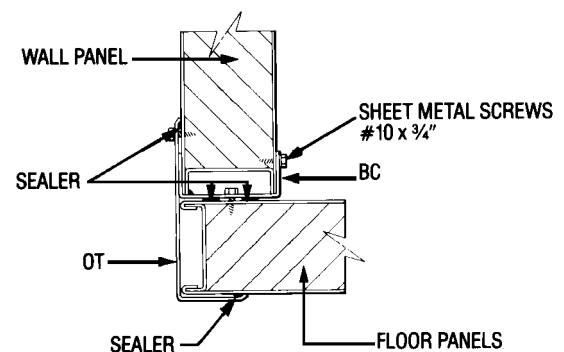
INTERMEDIATE DECK DETAIL (ELEVATION VIEW)
